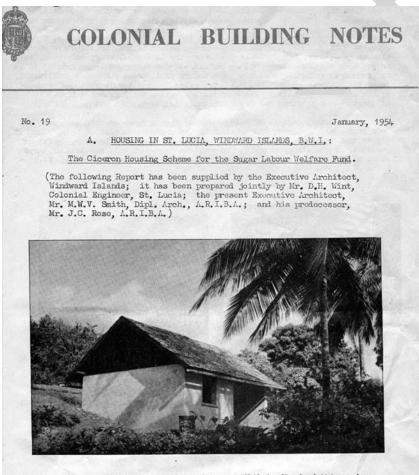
<u>Clearon Housing Scheme</u>; two-room house of cement-earth block walls, local timber roof constructed for <u>226</u>; two rooms can be added to give a total floor area of 513 aq.ft. (original floor area 255 sq.ft.); a separate bored-hole latrine is supplied and a 6' x 4' x 4" concrete slab as the floor for a kitchen to be erected by the tenants. Figure 2 Cover of *Colonial Building Notes*.
